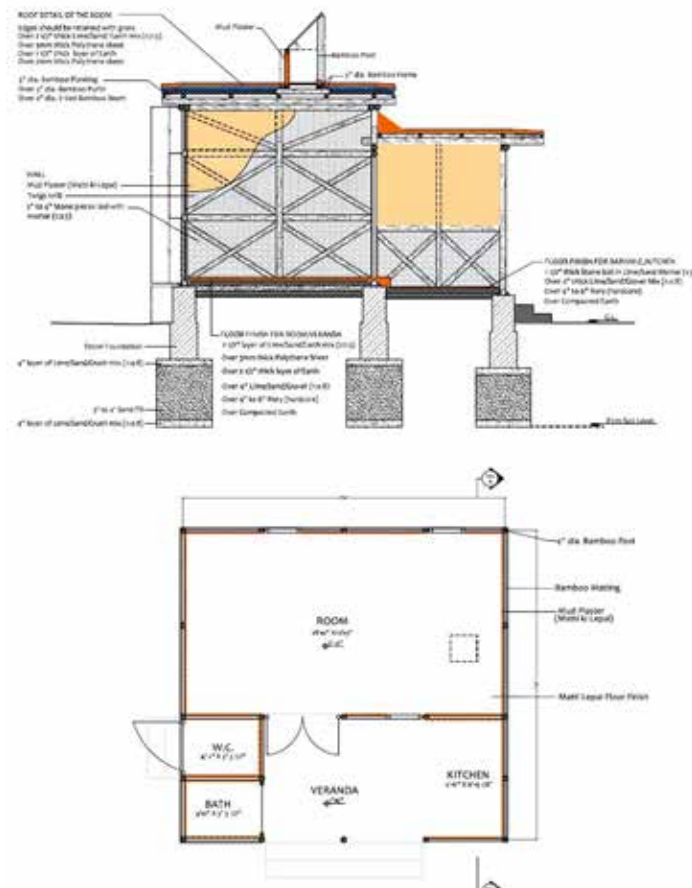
Green KaravanGhar Module, Section and Plan [5]
